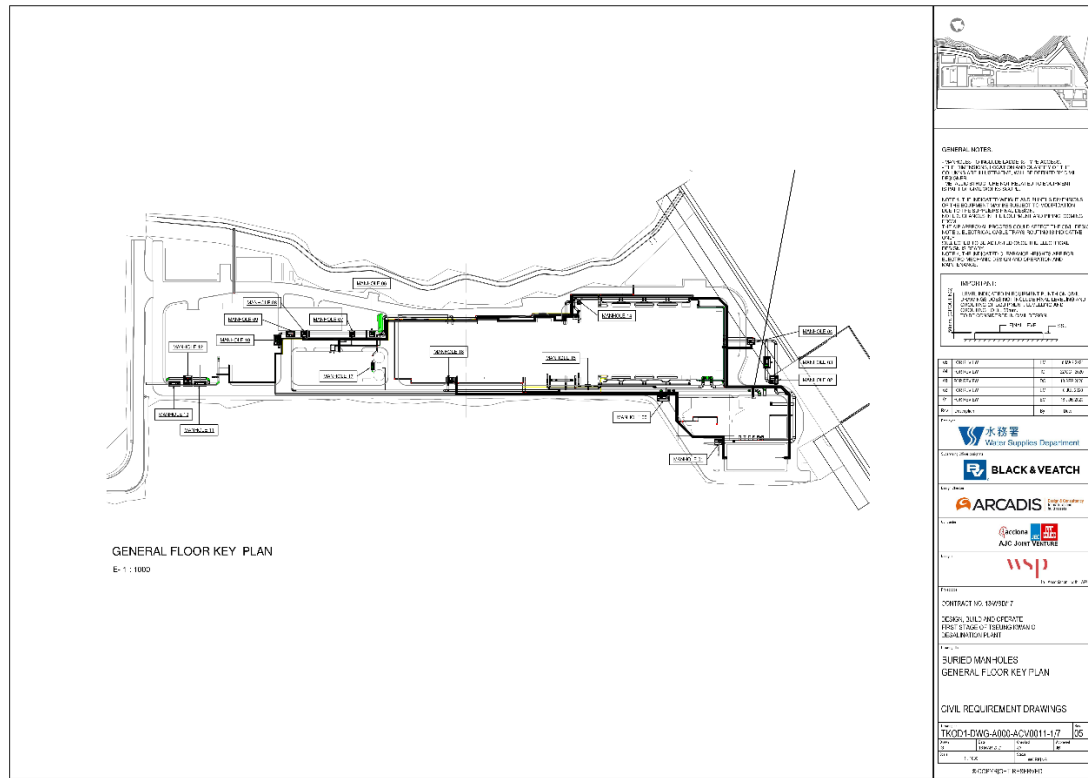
Landfill Gas Monitoring Location For Manholes/Pits
